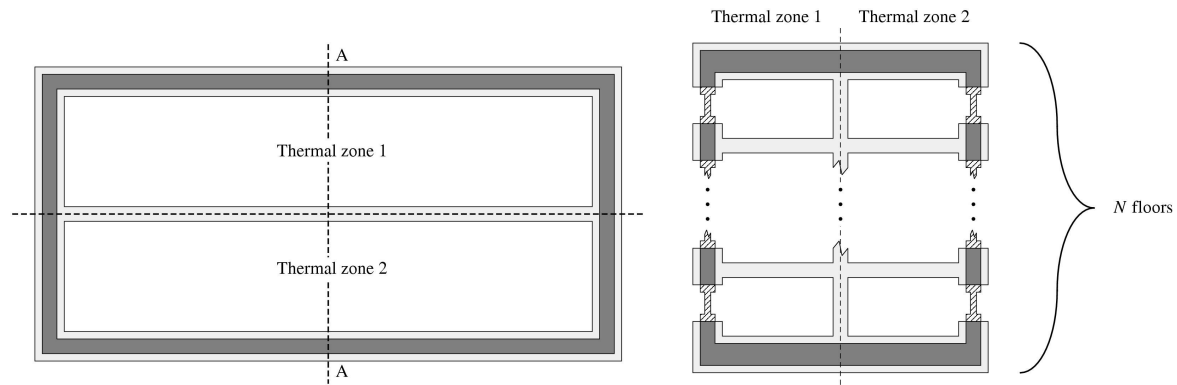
Left: Layout of the conceptual building. Right: The cross-section A-A.
